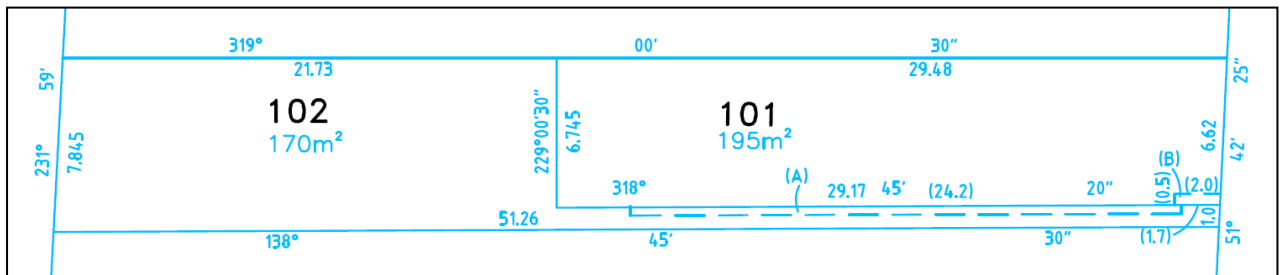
DA2021/01656 – Proposed draft subdivision plan
